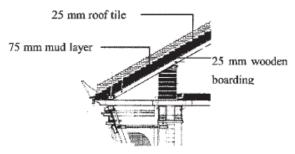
A Typical Roof Section of a Traditional Building Source: Upadhyay, 2006
